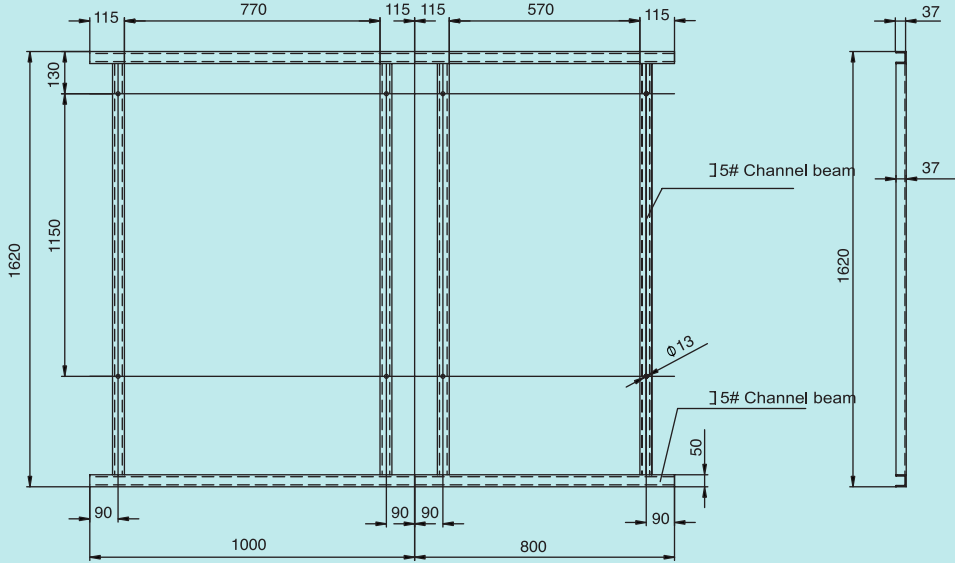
Typical basic frame foundation (for 1000mm/800mm width dimension model)
